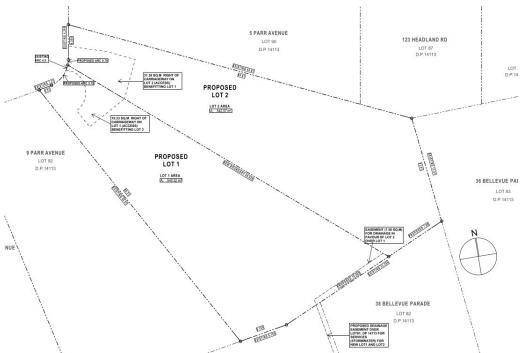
Proposed Subdivision Plan - Gartner Trovato Architects - Dated 29 January 2024 - Revision B
